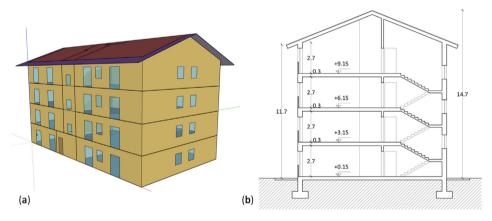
(a) Building perspective; (b) Cross section of the selected building.
